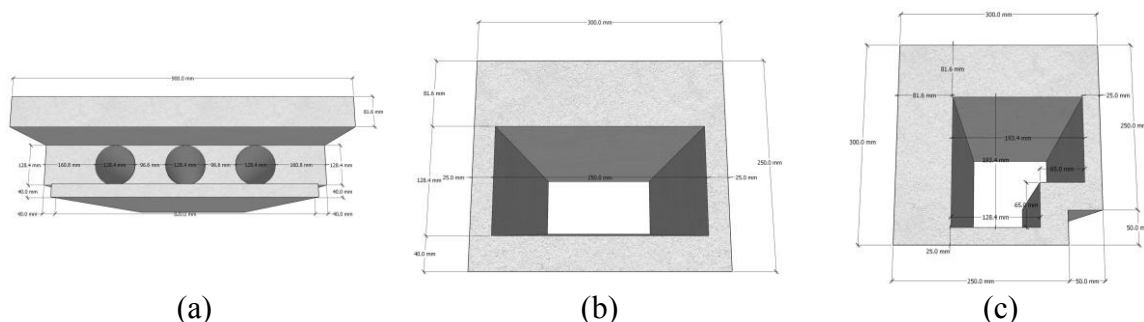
MICADO Elements: (a) Drilling section; (b) Rectangular section; (c) L-shaped section.
